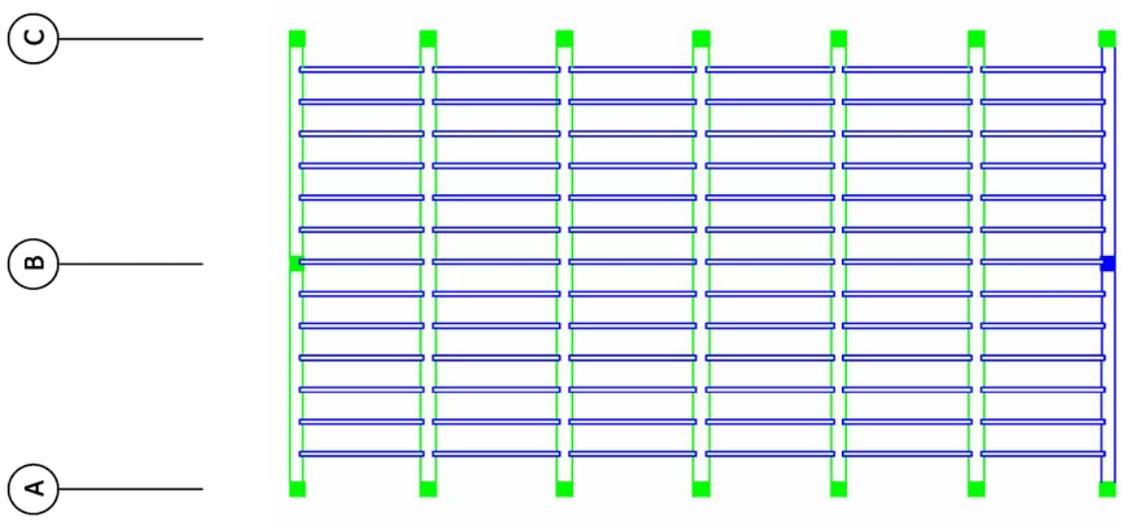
First-floor framing plan from evidence documented at disassembly in 2003.
